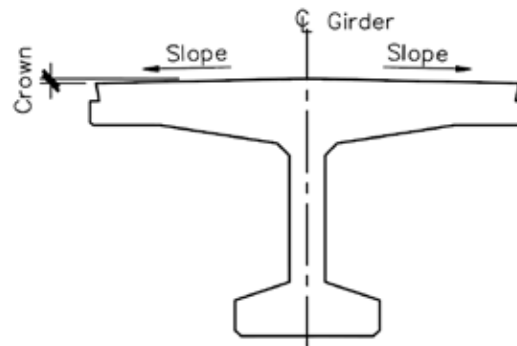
Center girder with top flange screeded to match desired roadway crown.
